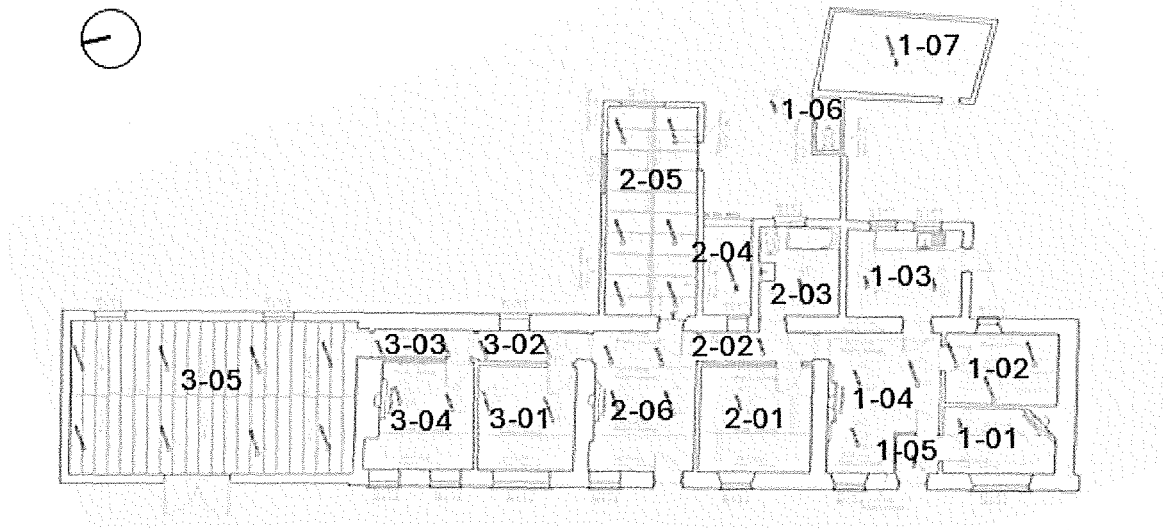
The cottages. Ground Floor key plan with added room numbers. Source: Shay Cleary Architects & Apex surveys.
